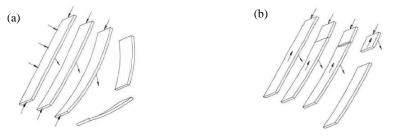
Failure mode of layered rock mass during tunnelling. (a: left-side arch; b: right-side wall).
